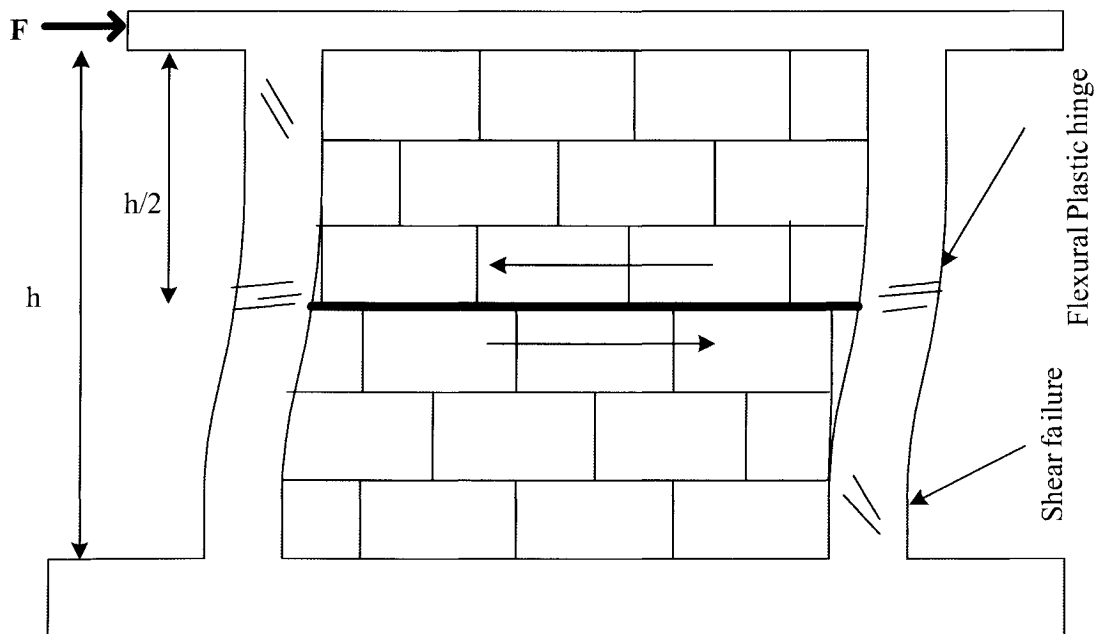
Knee frame model for sliding shear failure of masonry infill wall
